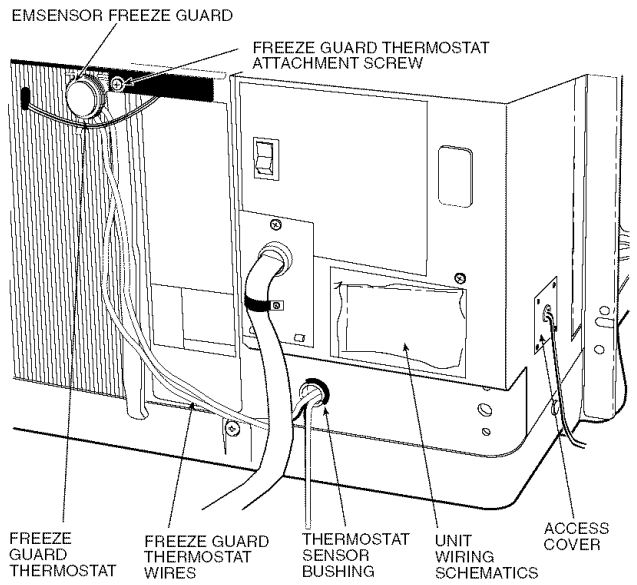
Location of Freeze Guard Thermostat and Wires Through Bushing on Control Box
